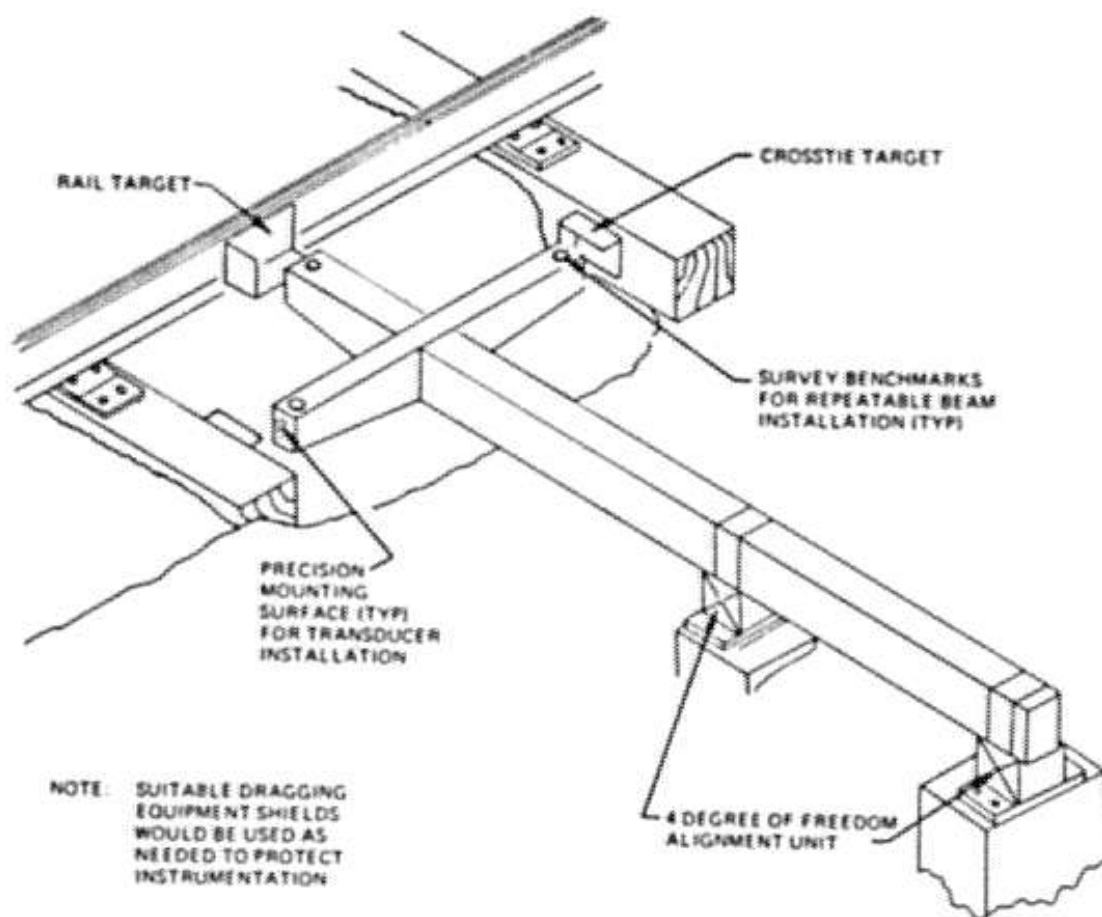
CANTILEVERED INSTRUMENTATION MOUNTING BEAM CONFIGURATION
